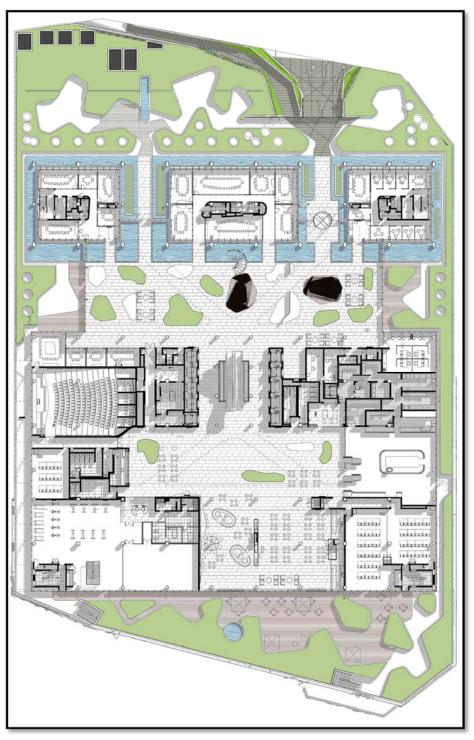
Ground Floor Plan of Alexander Forbes, (www.paragon.co.za)
